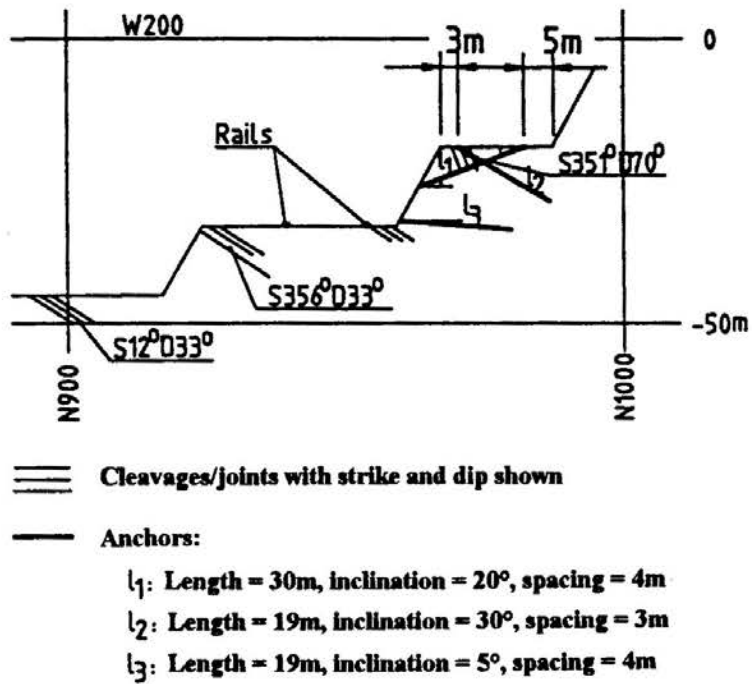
Cross-Section and Anchor Layout for Slopes at Station W200
